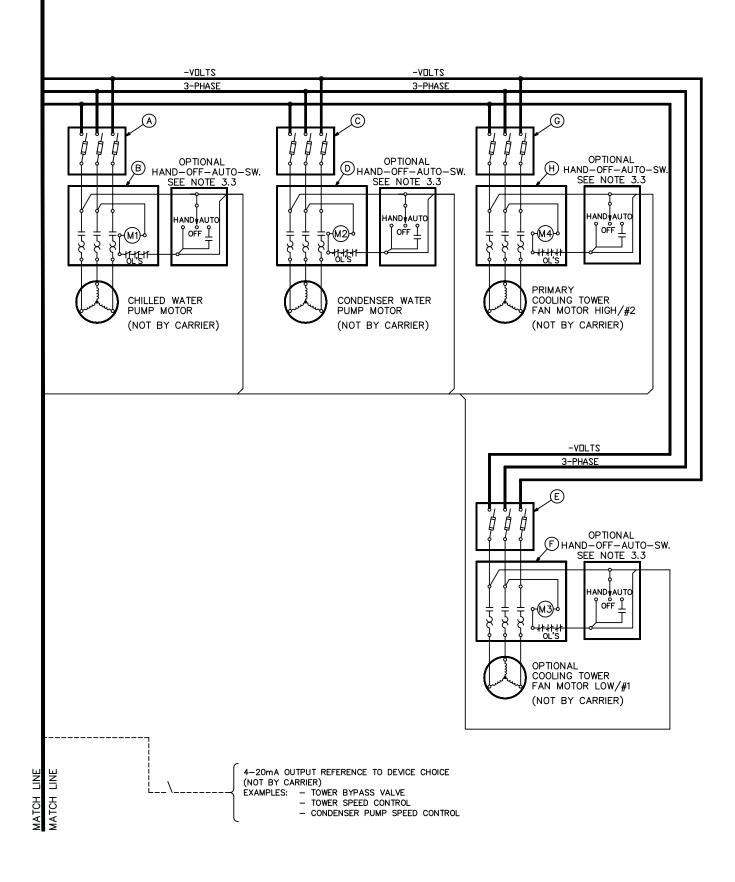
19XR Typical Field Wiring with Unit-Mounted Starter (Benshaw Starter Shown) (cont)
